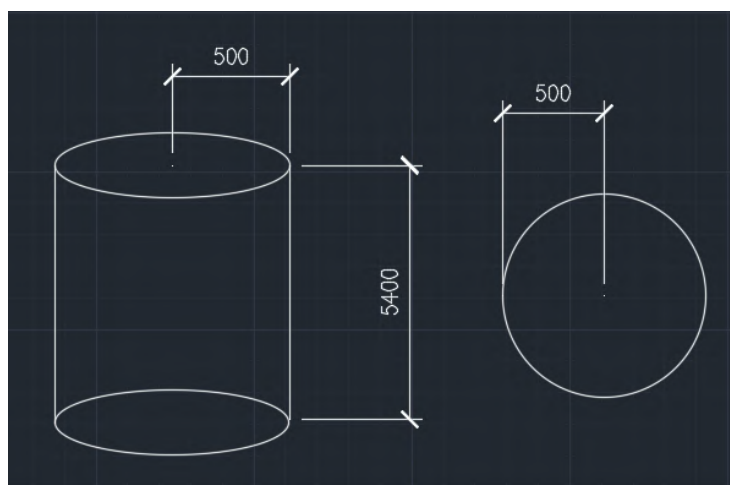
In-detail dimensions of the circular reinforced concrete columns in millimetres
